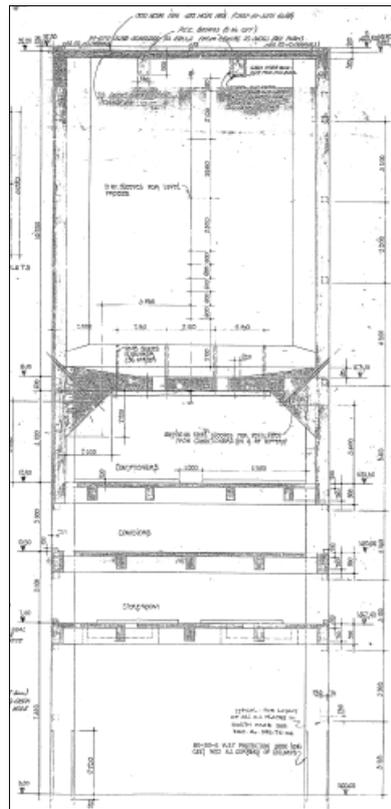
Cross-section of the FAB building (extract from drawing no.: 0.63/13292)
